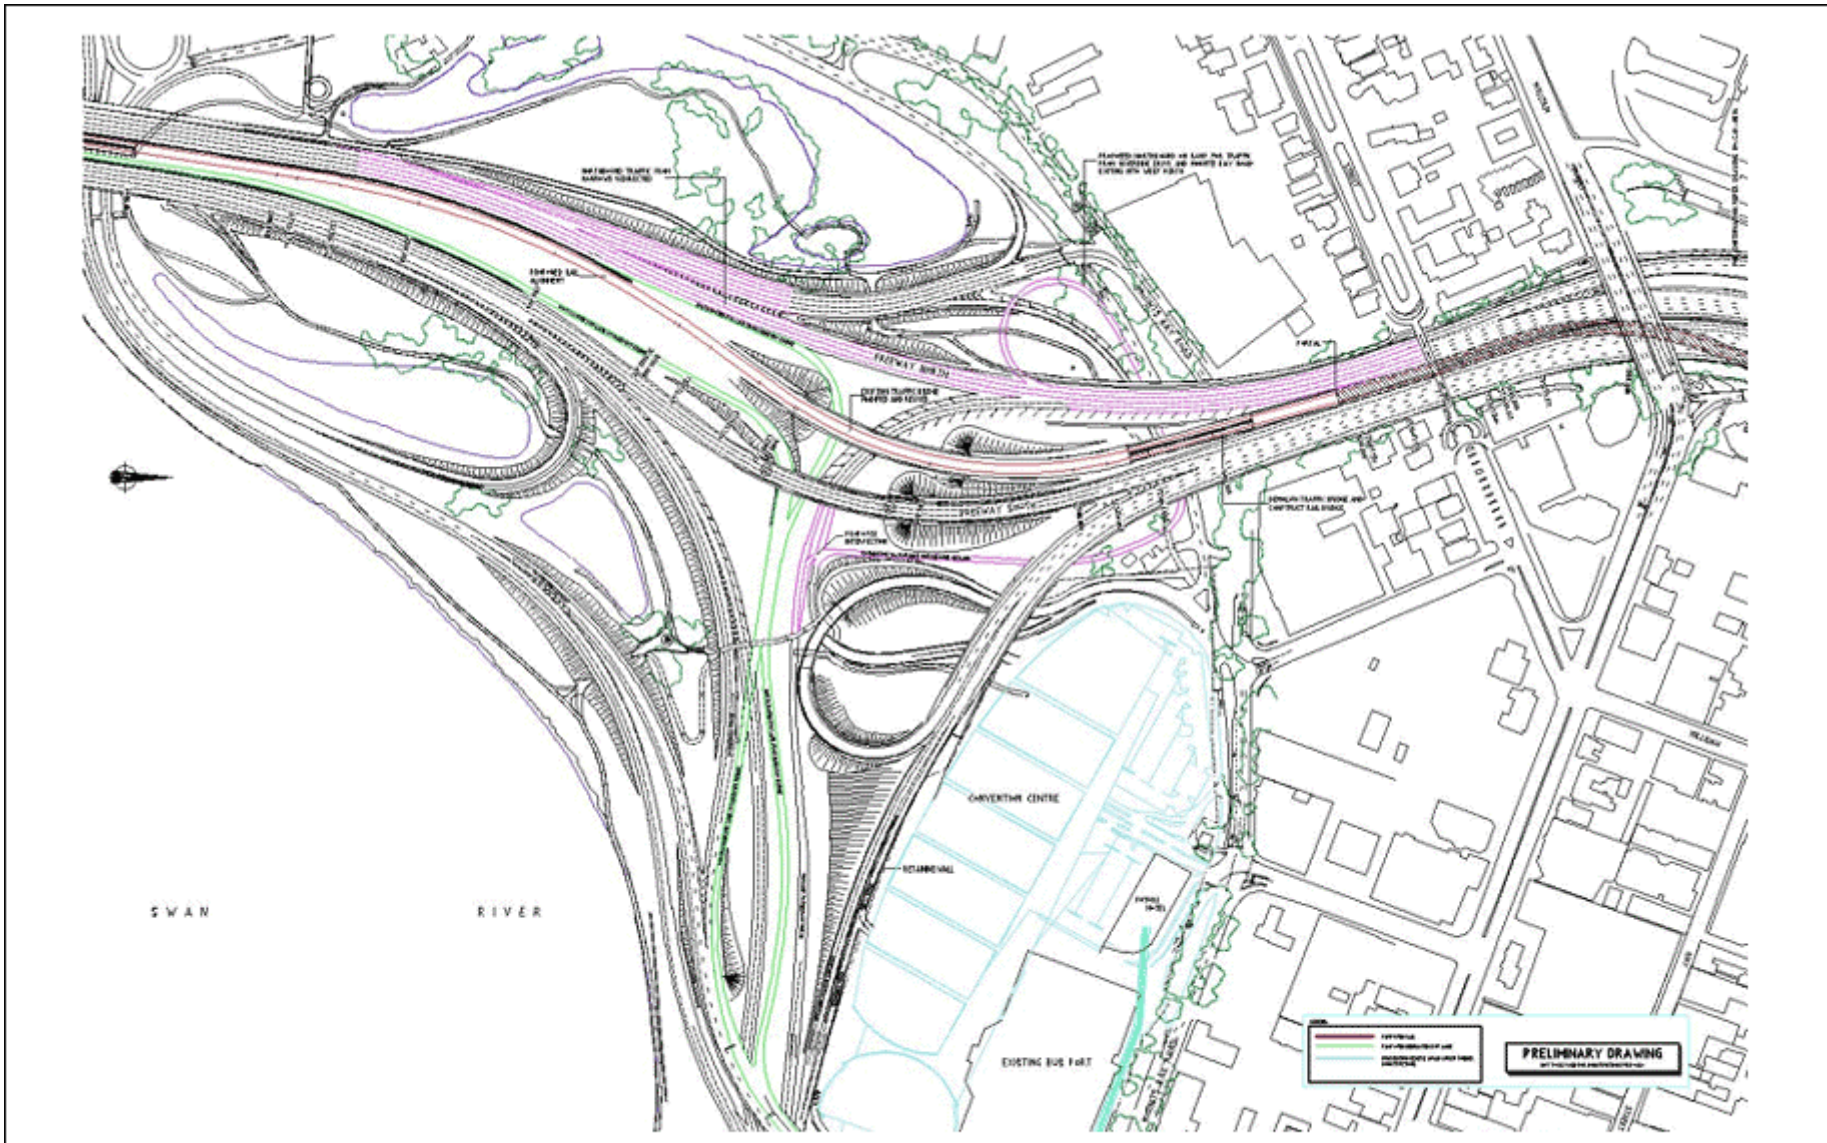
Western Option Route (Option 3PCC(I)) (Narrows Bridge to Malcolm Street)
